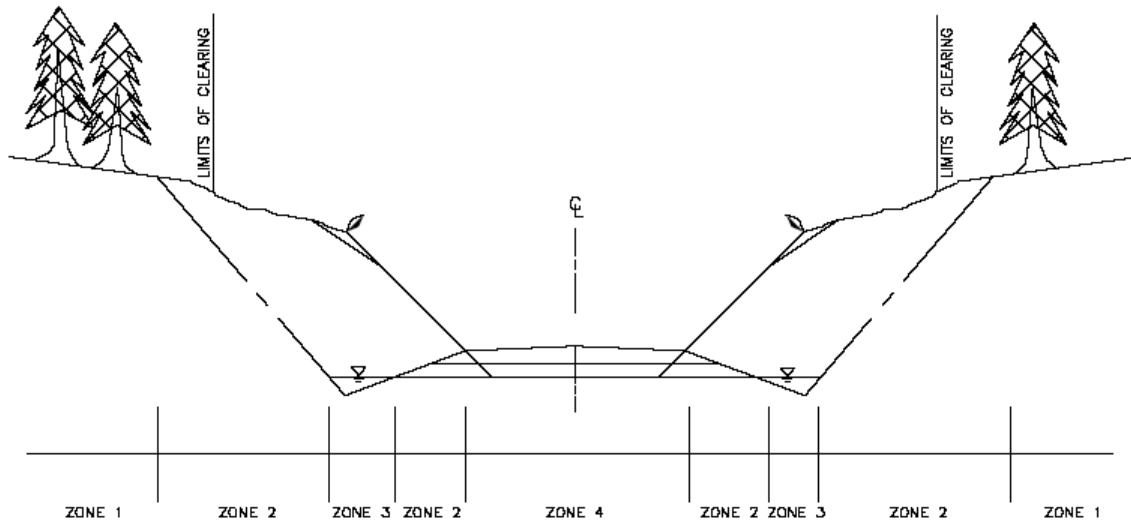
Roadway BMP and LID Zones for Cut Sections.
